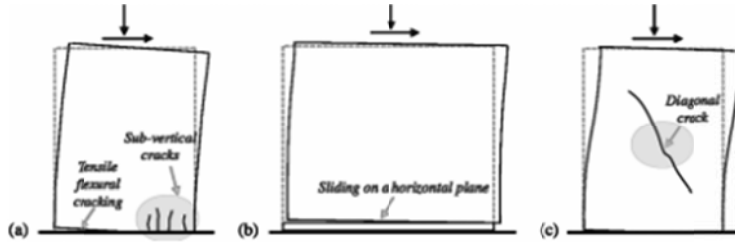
Typical failure modes of masonry piers due to horizontal loads: (a) rocking; (b) sliding shear; (c) diagonal cracking. (Calderini, 2009)
